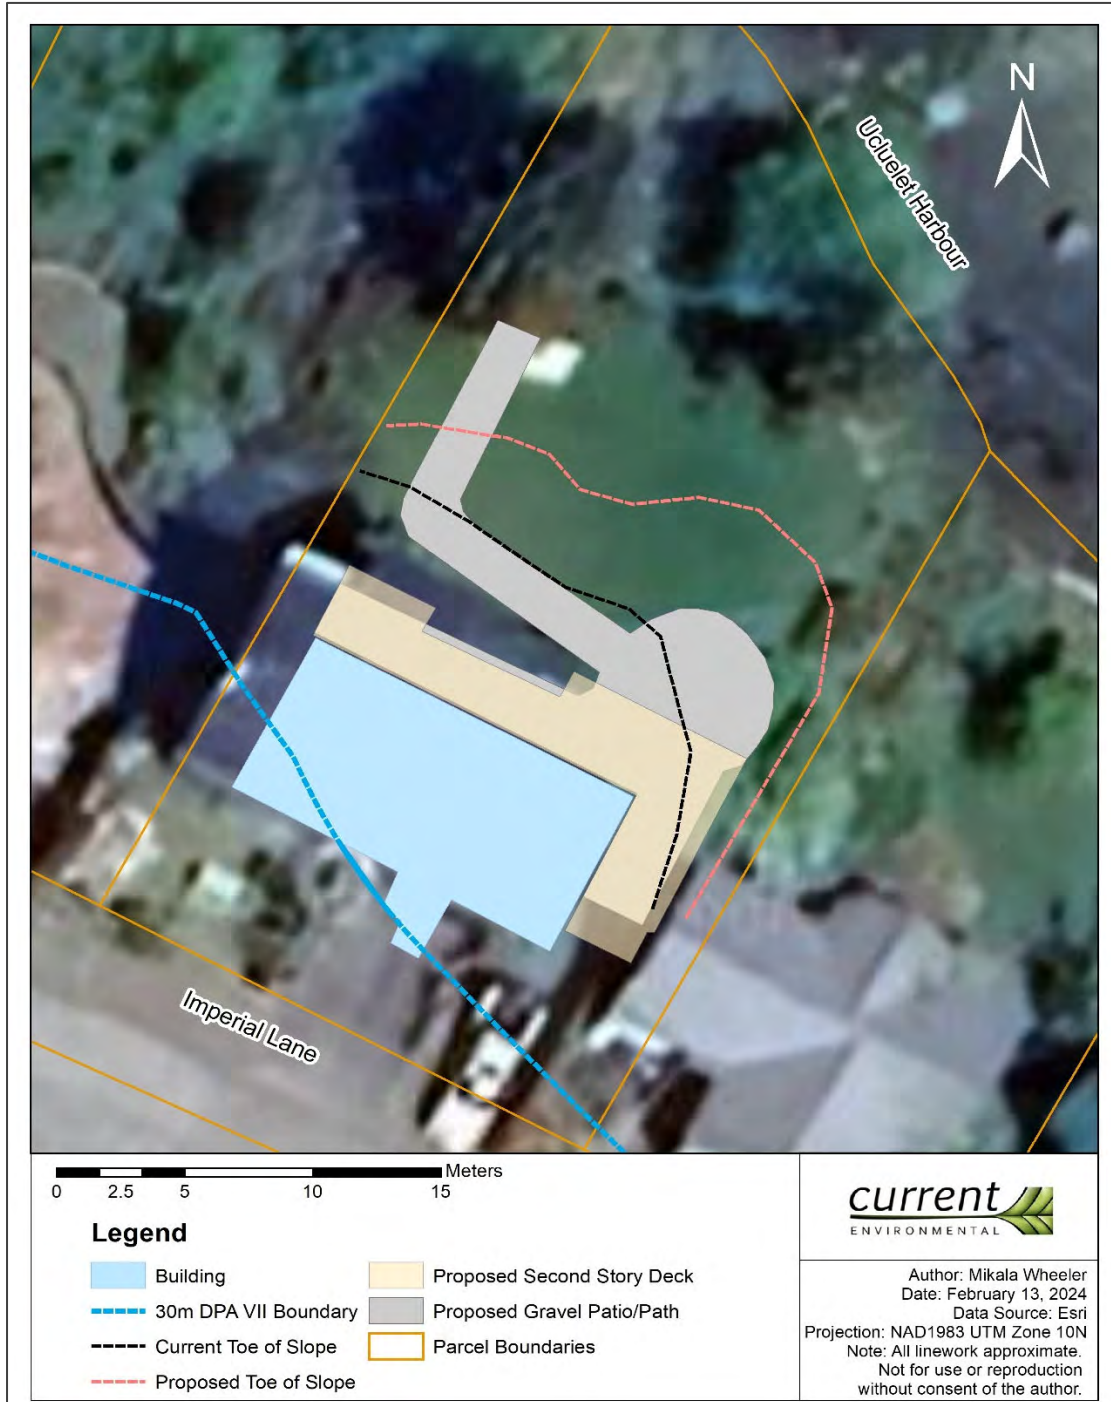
Proposed gravel patio, path, and deck plans at 1567 Imperial Lane.
